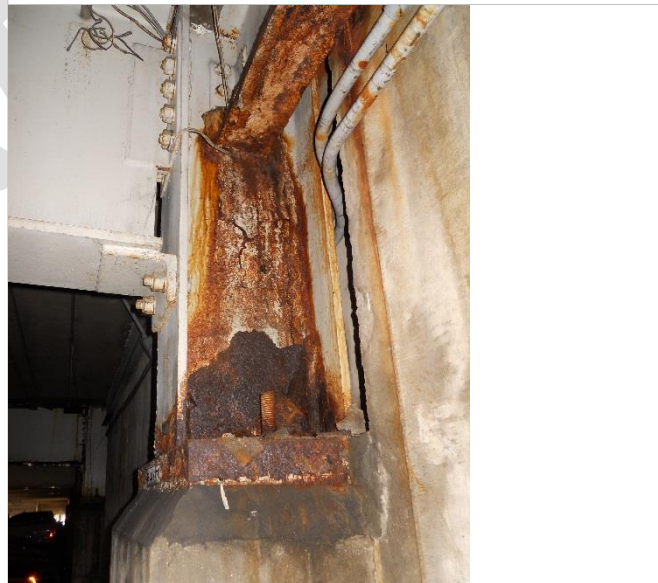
Level 2 framing connection. Note corroded condition of high strength bolts and nuts.
